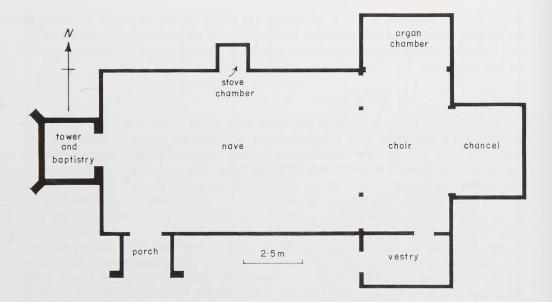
Groundplan of St. Peter's Chapel, Stow Bardolph, adapted from the architect's 'Specification of Work and Materials' (reproduced by kind permission of the Churchwardens)
